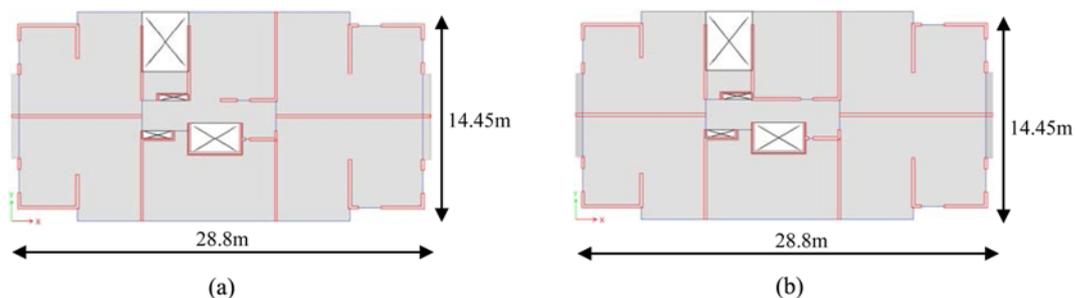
Ground Floor and Standard Floor – Building Type A: (a) Ground Floor - Type A Building, (b) Standard Floor - Type A Building
